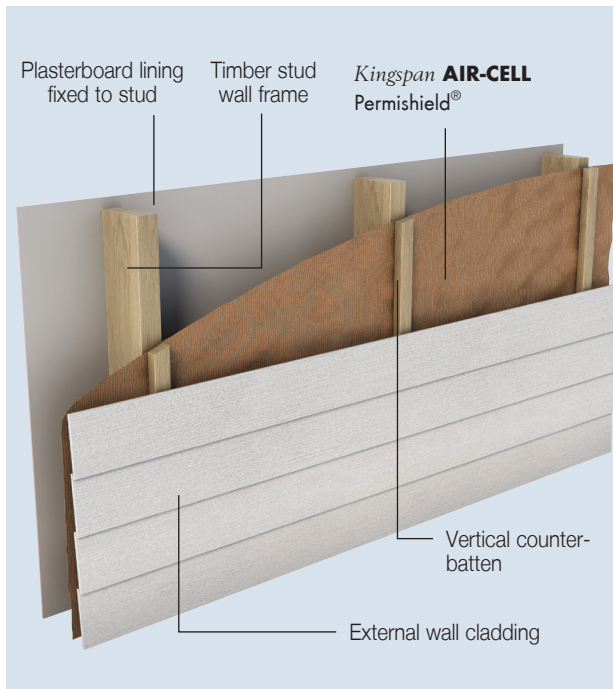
Kingspan AIR-CELL Permishield® XV in a timber-framed wall installation using counter-battens
